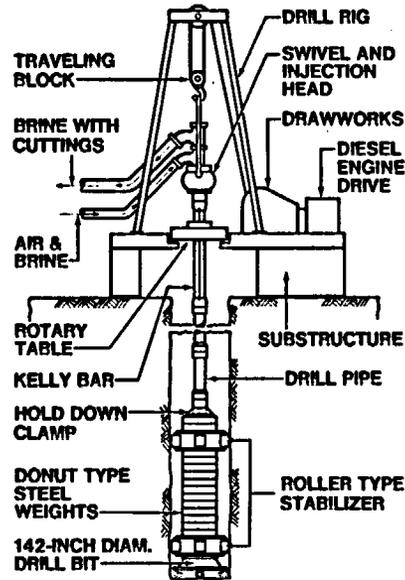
GENERAL ARRANGEMENT OF DRILLING EQUIPMENT
